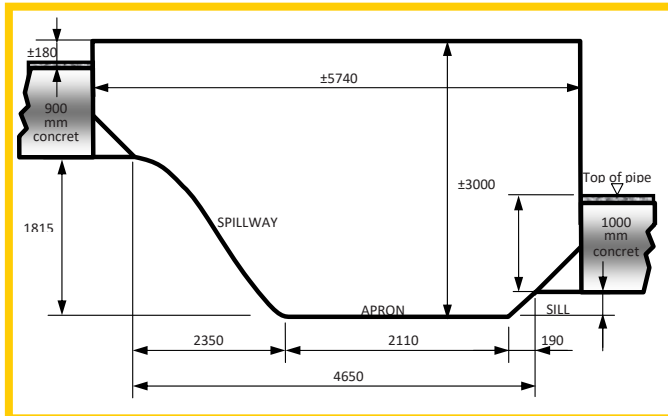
Section through Drop Structure giving Internal Dimensions (not to scale)
